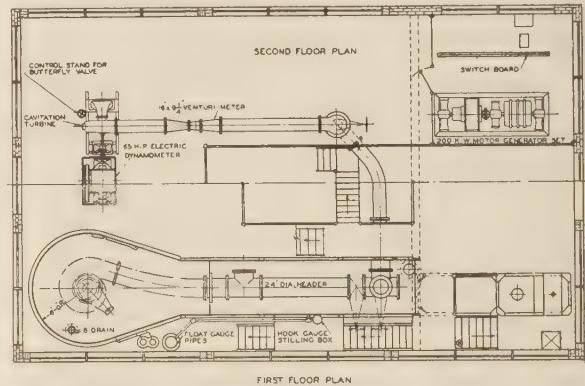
PLAN VIEW OF THE HYDRAULIC LABORATORY OF THE NEWPORT NEWS SHIPBUILDING AND DRY DOCK COMPANY
